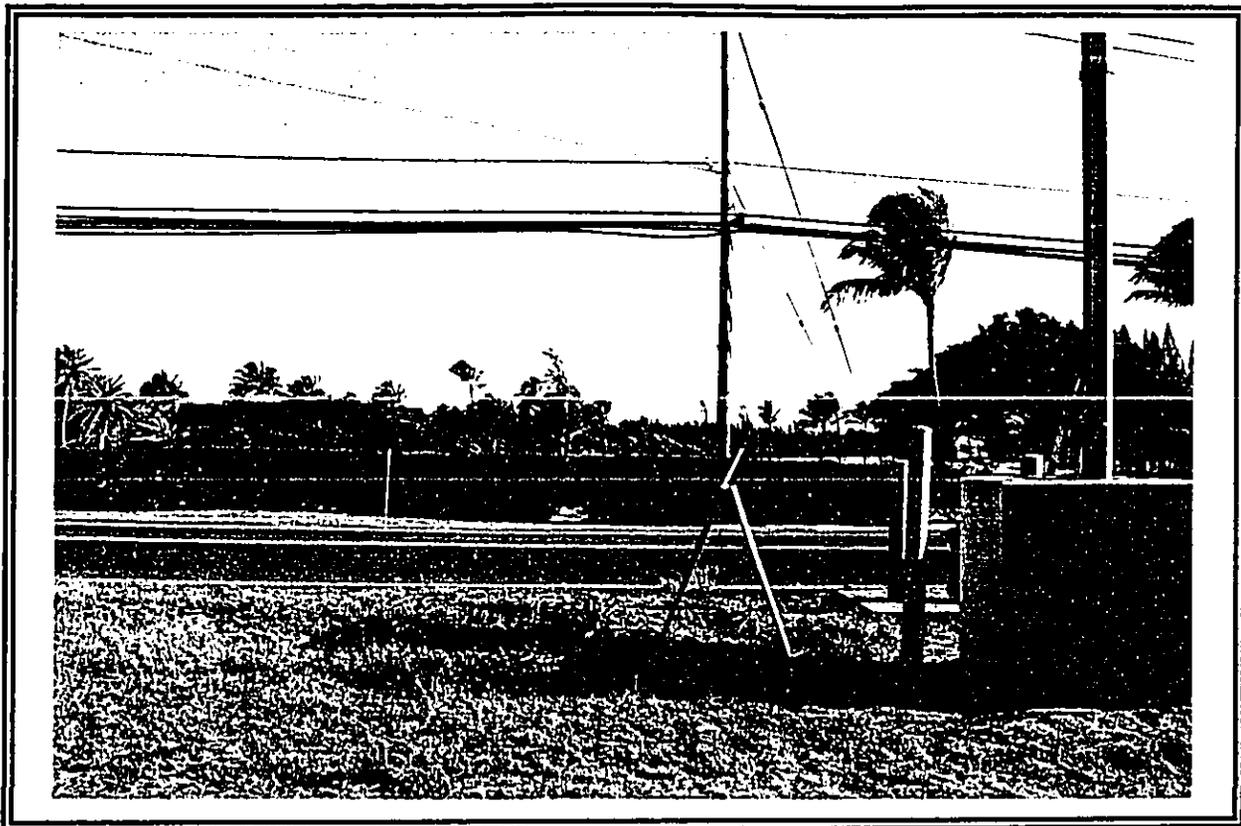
View looking toward hotel from Kamehameha Highway
